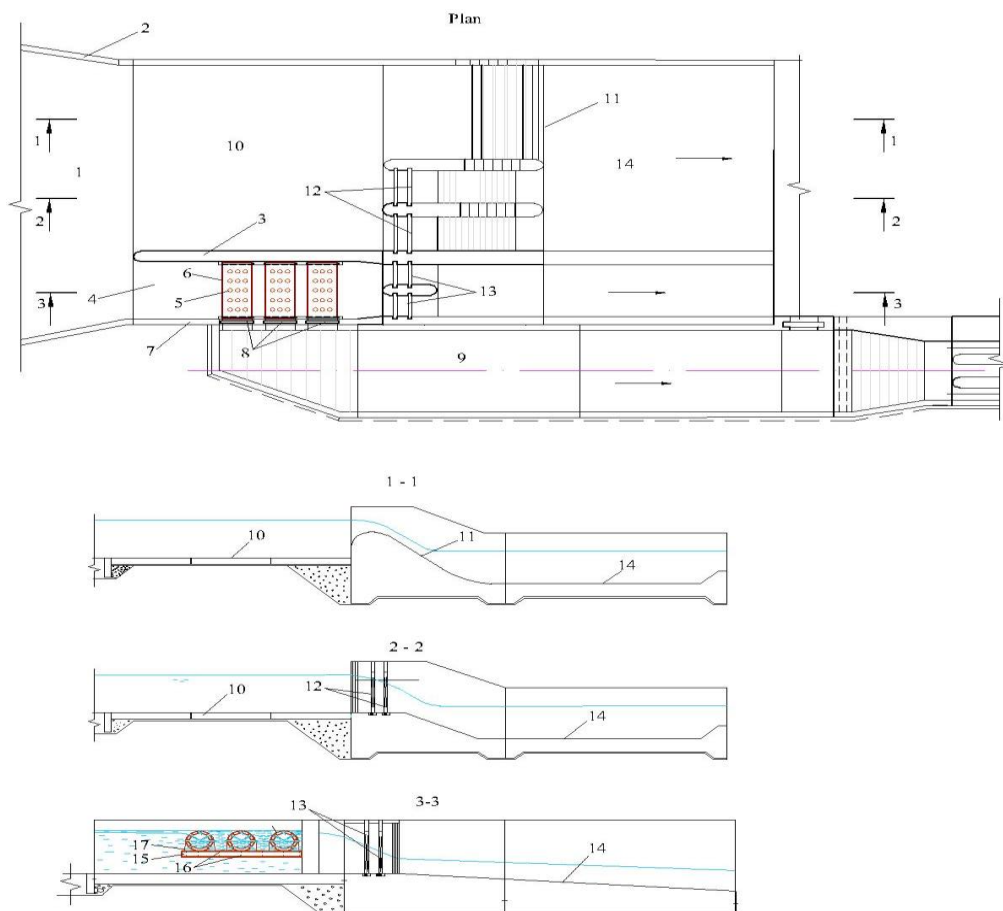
Plans and sections of a frontal water intake structure with a pocket
